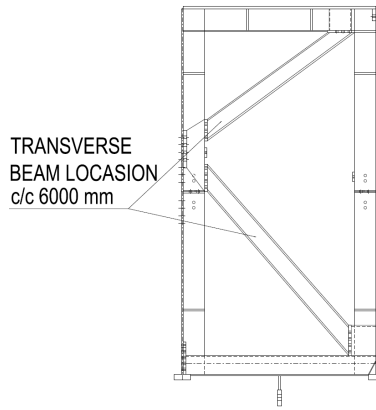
Transverse stiffening at transverse beams c/c 6000mm
